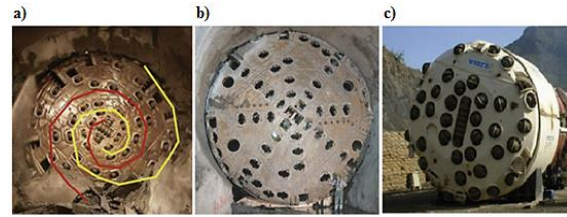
Different layouts of cutting tools in TBM, (a) Spiral layout, (b) Star layout, (c) Stochastic layout.
